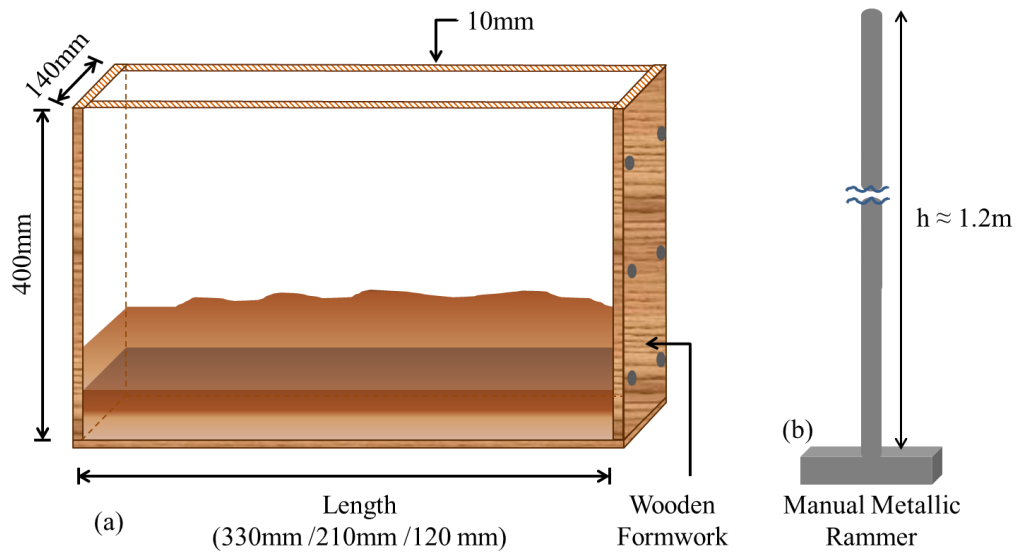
(a) Wooden Formwork used for Ramming Prism Specimens, (b) Manual Metallic Rammer
